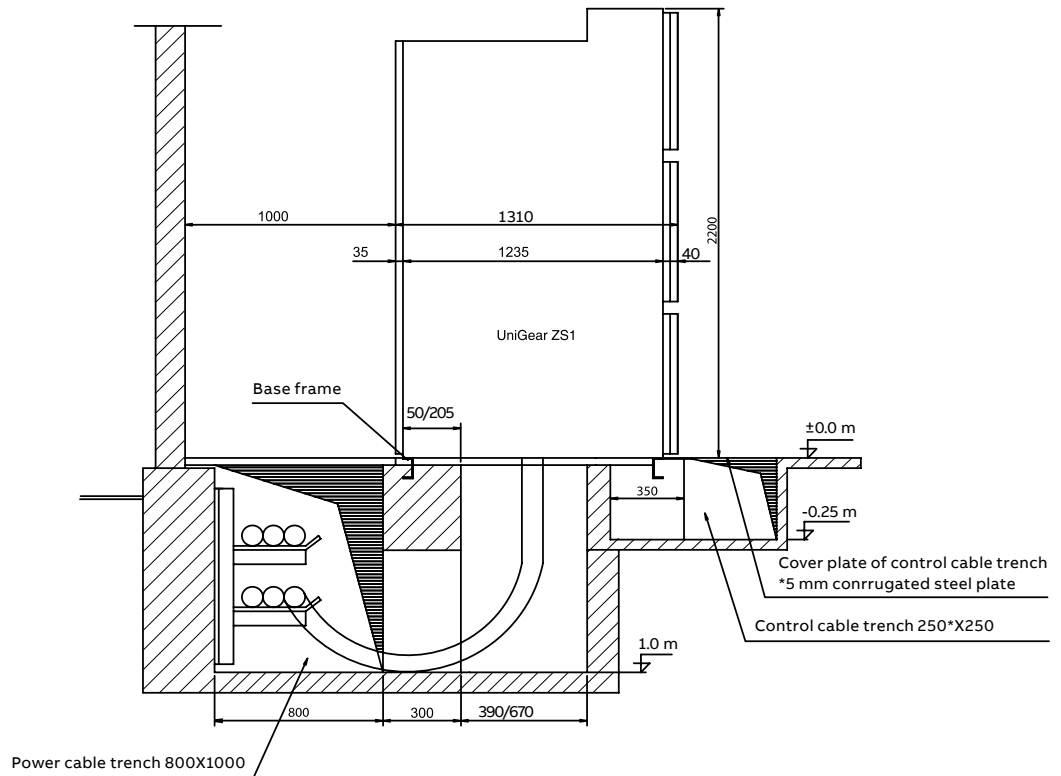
Typical plan layout of distribution room (A-A section view of figure 17.1)
